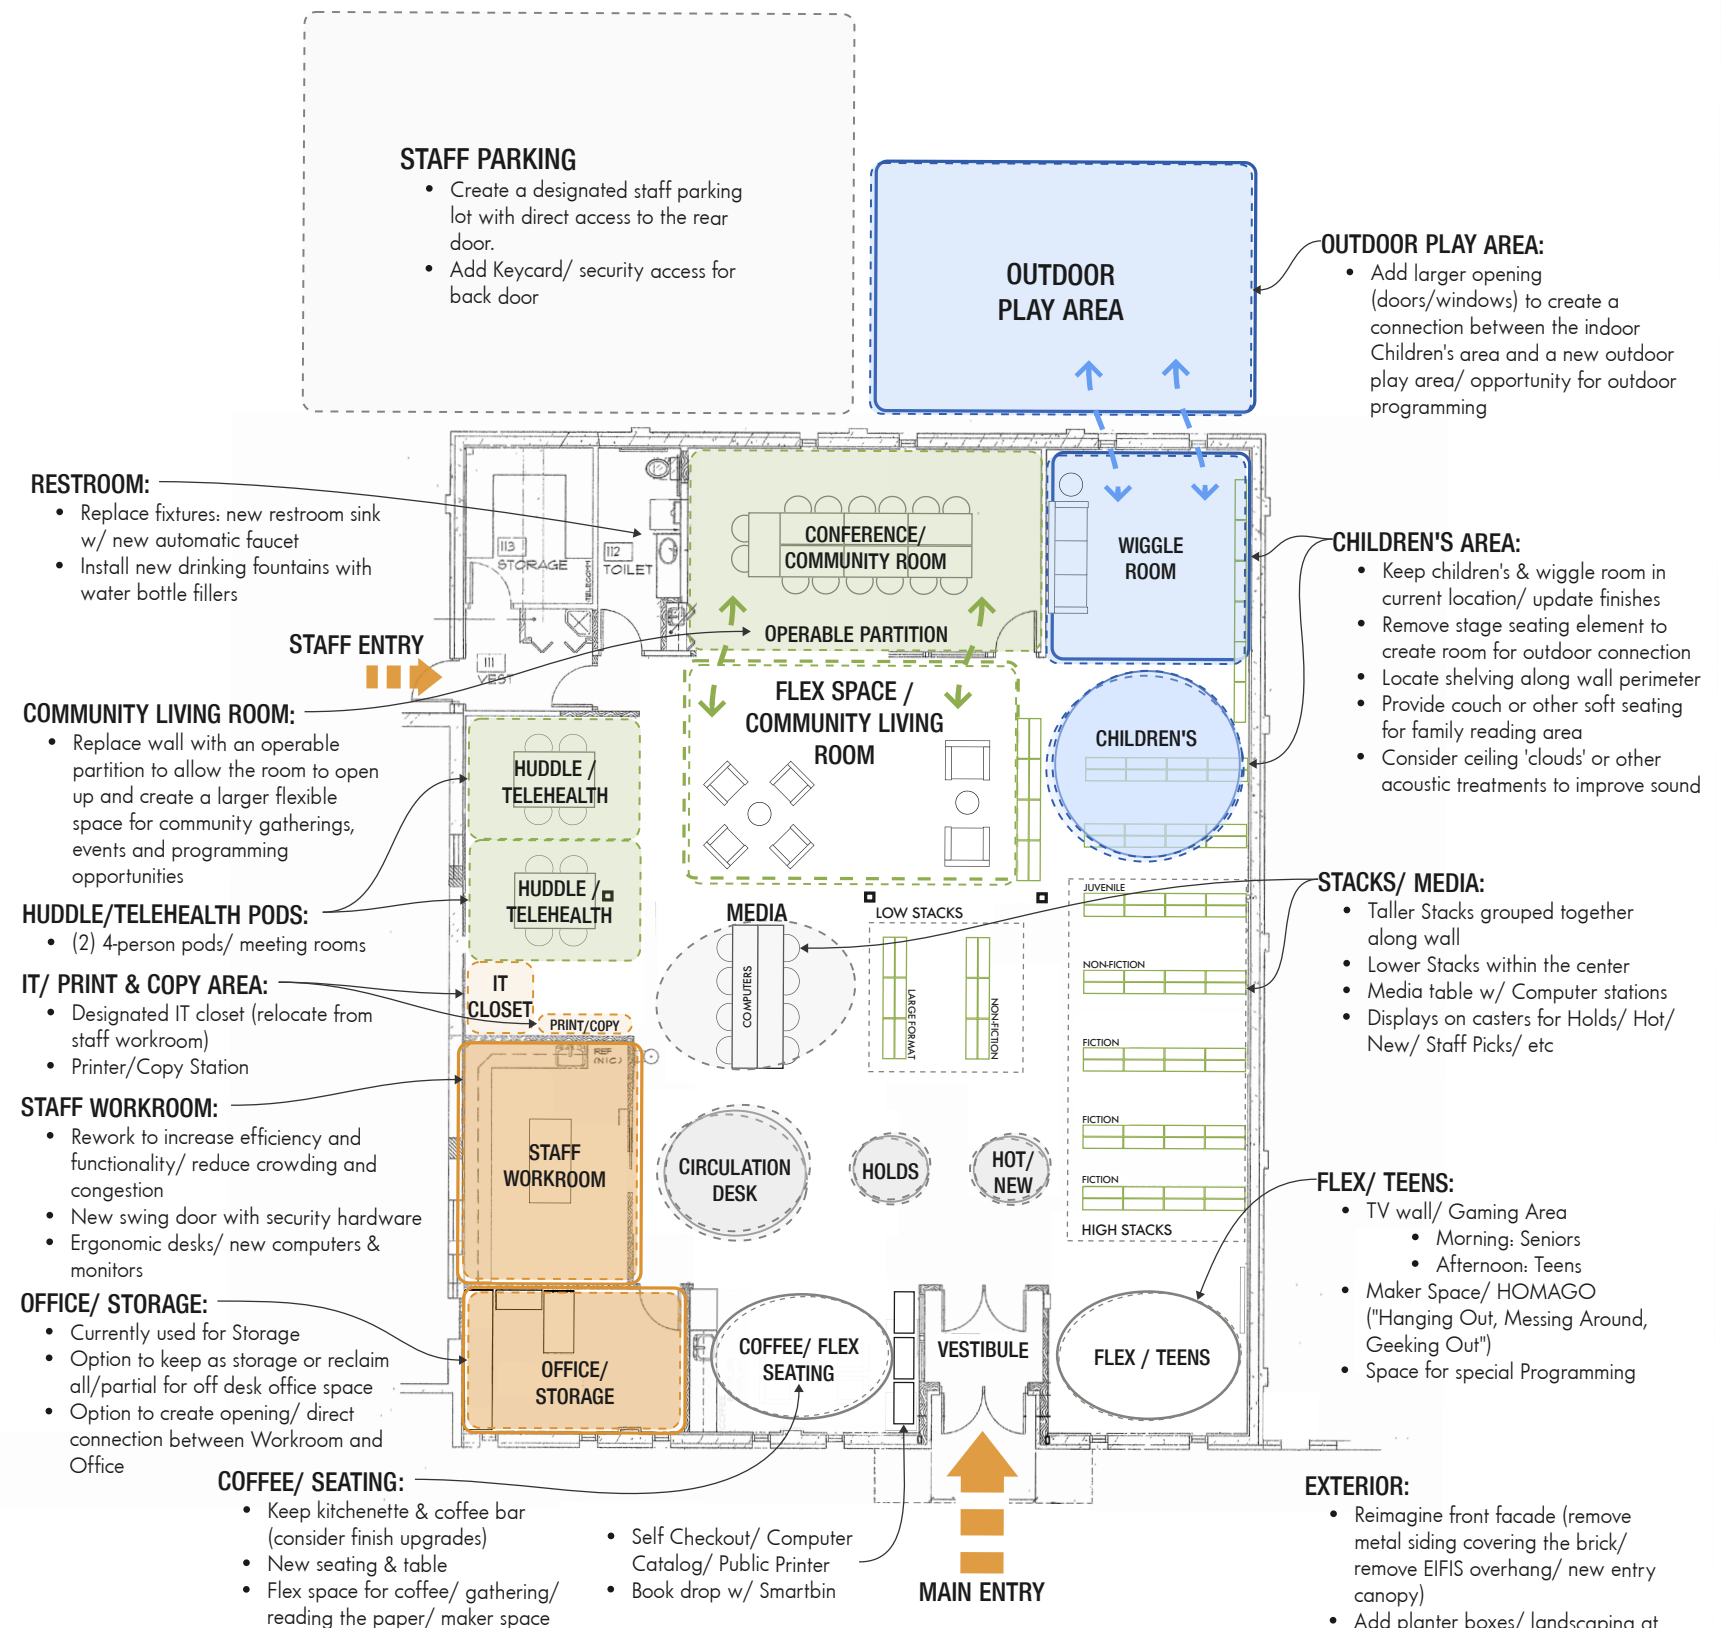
BURNS BRANCH, MAIN FLOOR PLAN, OVERLAY BY JLG ARCHITECTS
